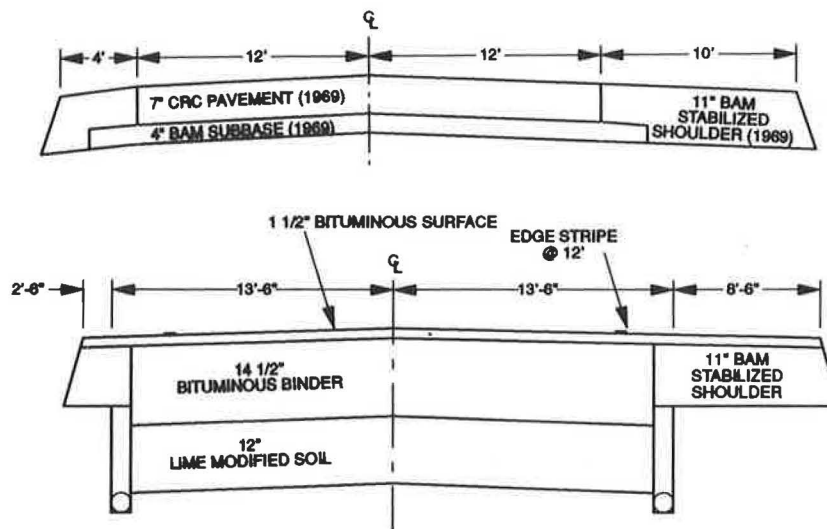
Cross sections of existing CRC pavement (*top*) and full-depth asphalt concrete inlay (*bottom*).
